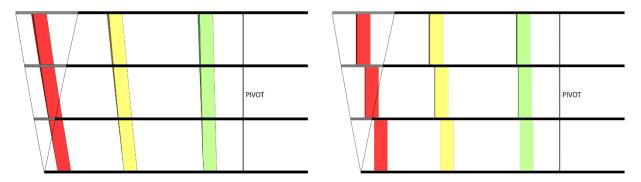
Effect of location of pivot line on columns in twisted buildings (drawing by author)
